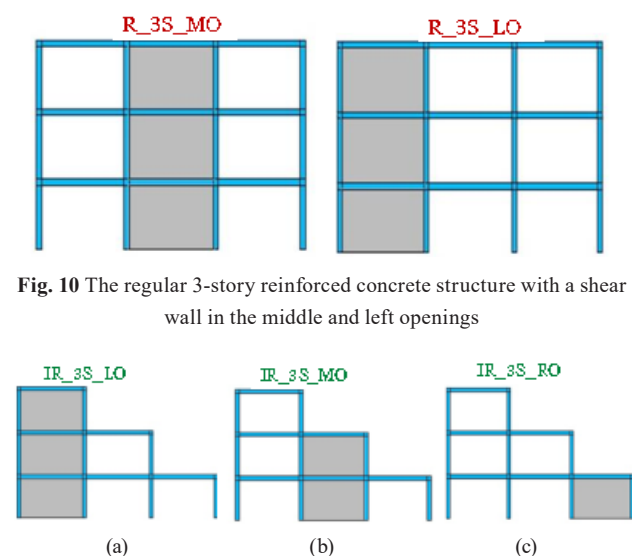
The regular 3-story reinforced concrete structure with a shear wall in the middle and left openings
